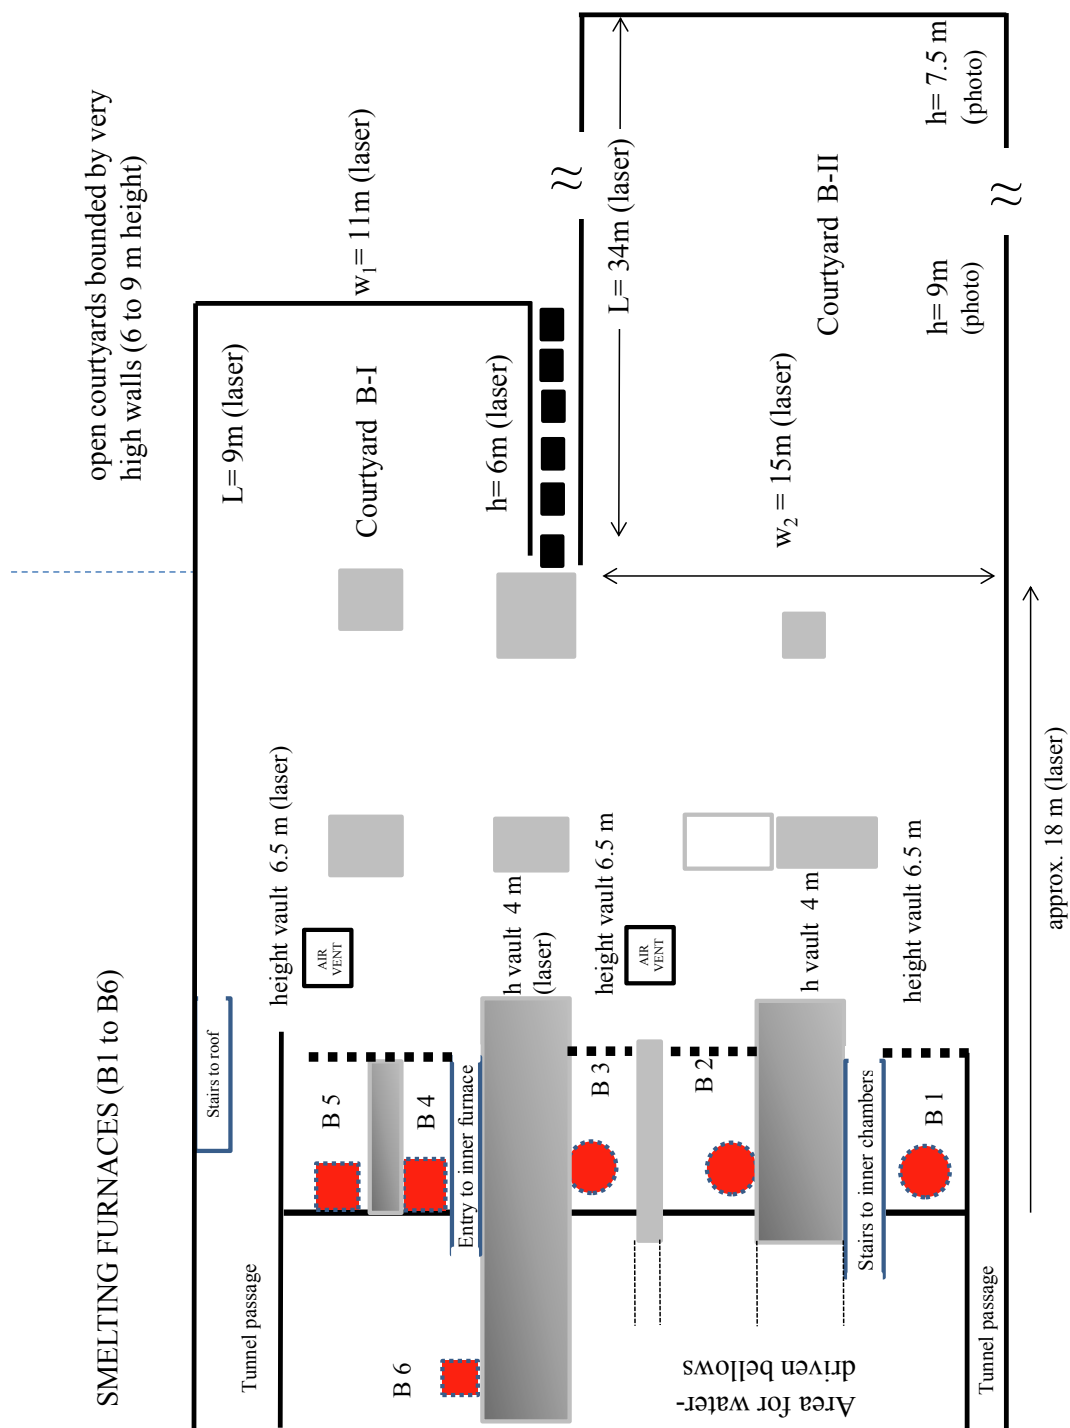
Plan of Furnace Area B, floor level including courtyards.
